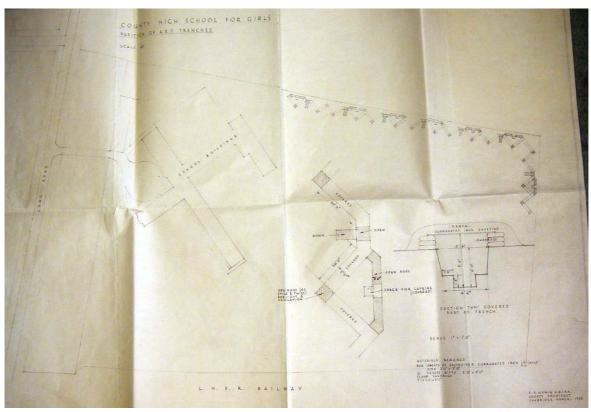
Layout of Proposed ARP Trenches Showing Outline of Building (S E Urwin)
